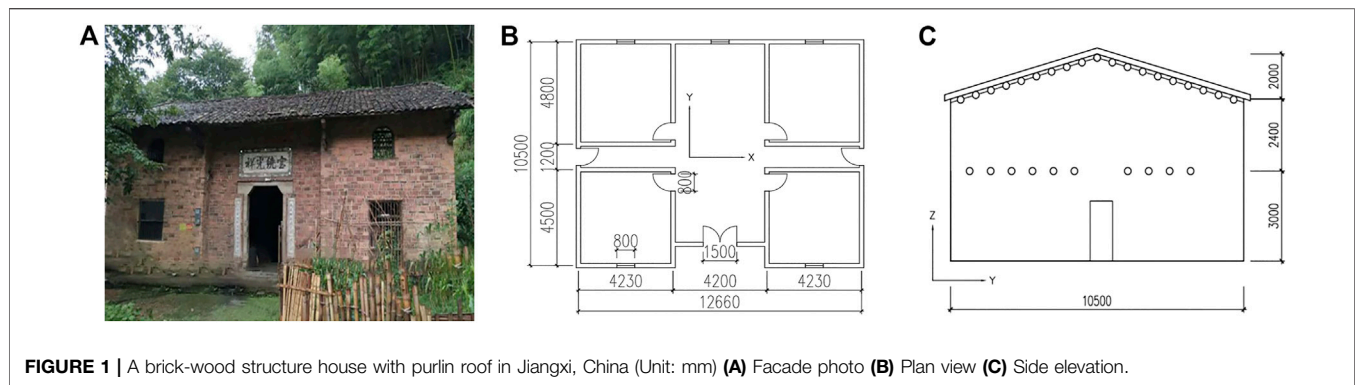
| A brick-wood structure house with purlin roof in Jiangxi, China (Unit: mm) (A) Facade photo (B) Plan view (C) Side elevation.
